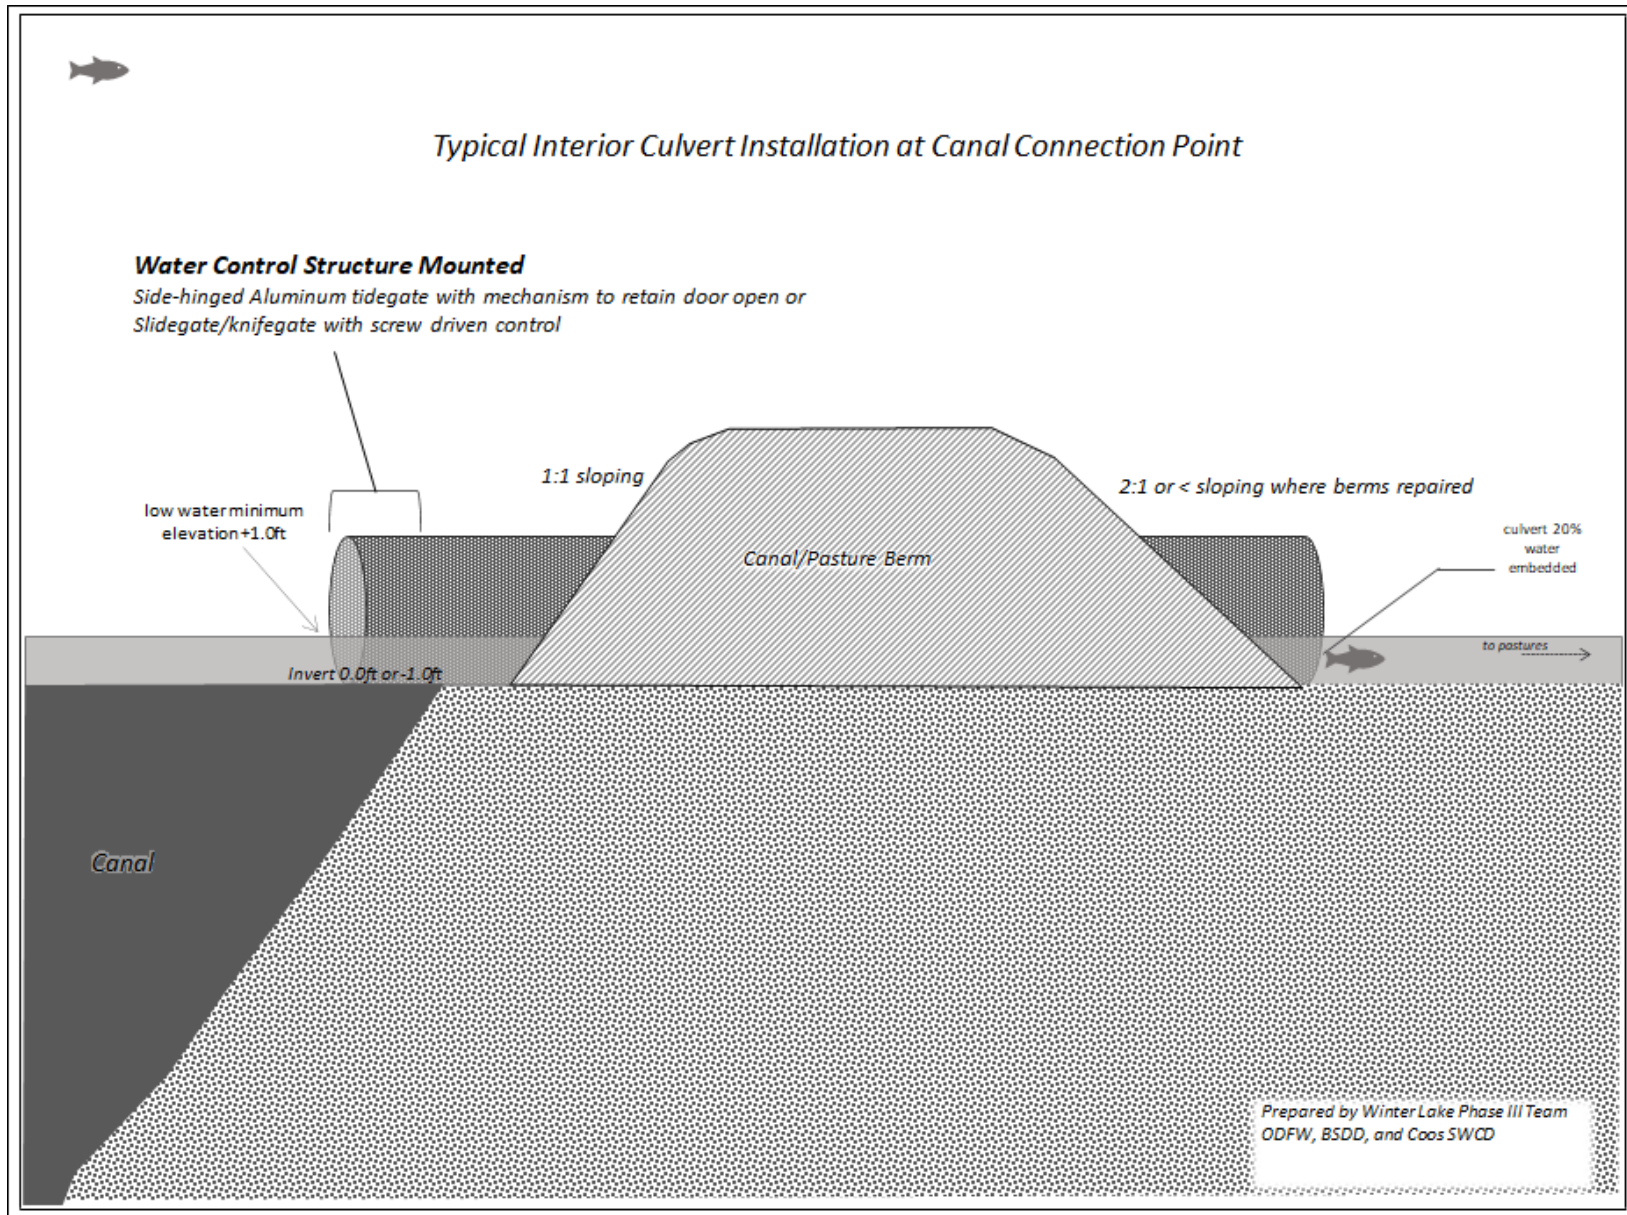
Winter Lake Phase III project typical interior culvert installation design.
